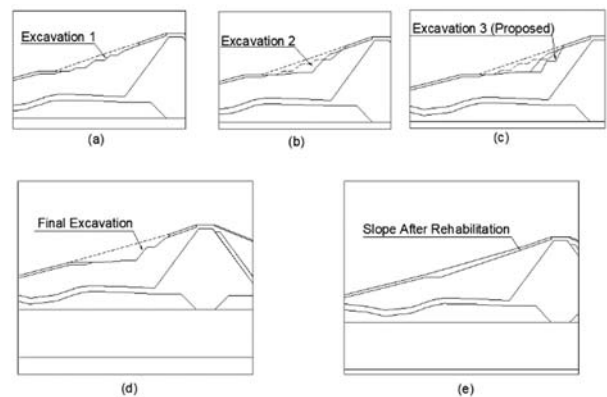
(a) Excavation 1, (b) excavation 2 (c) proposed excavation 3, (d) dam after excavation and (e) dam after filling and compaction
